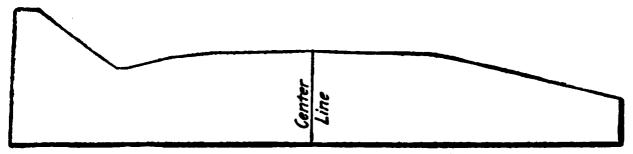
Transparent templet for use on cross-sections giving finished shape of road.
